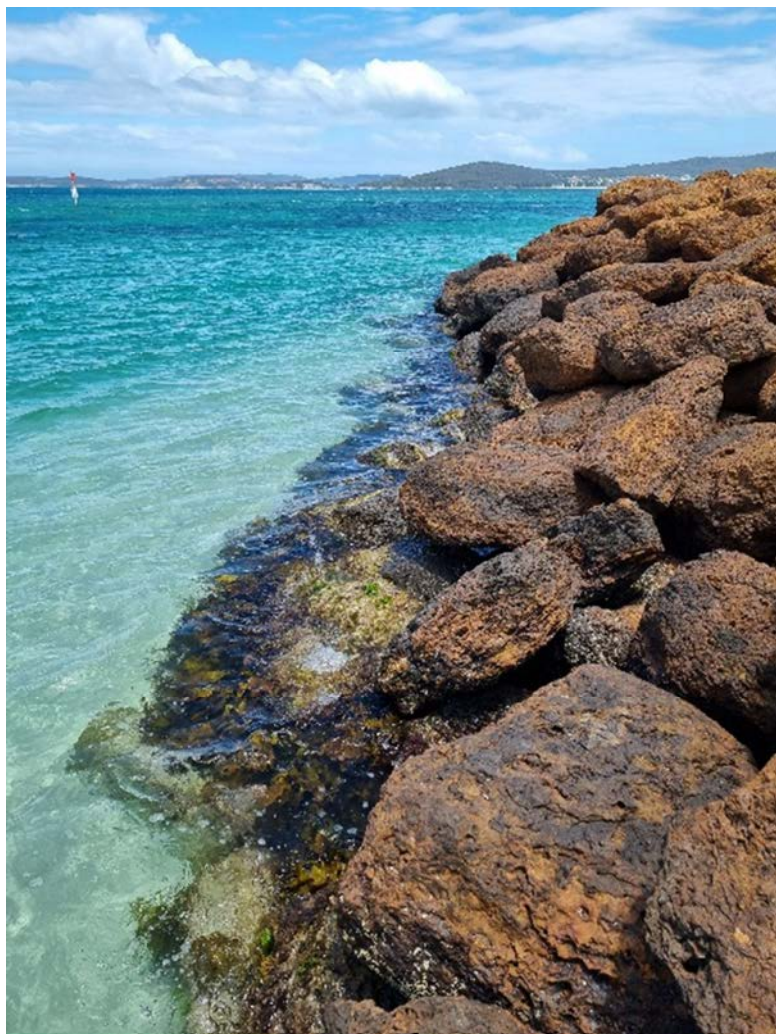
Artificial headland, taken facing southwest during site visit 5 December 2024.
